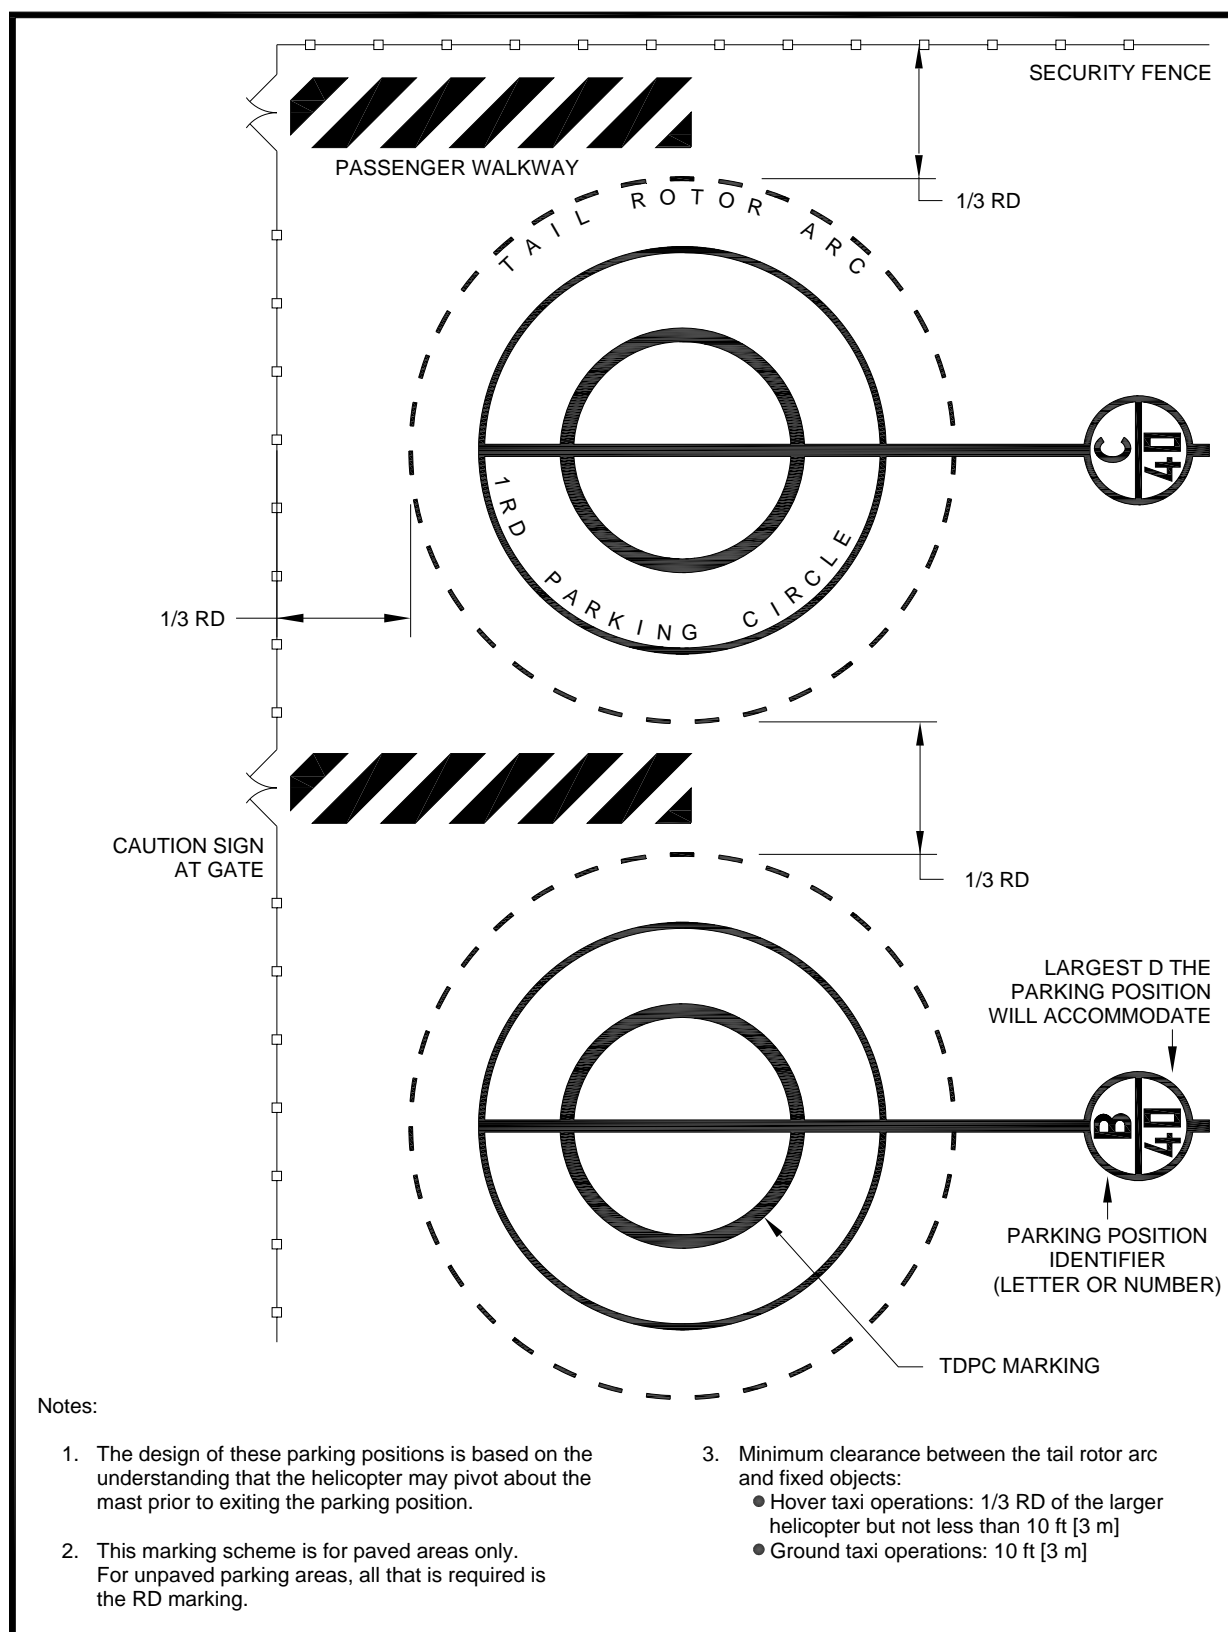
Parking Area Design – “Turn-around” Parking Positions:
